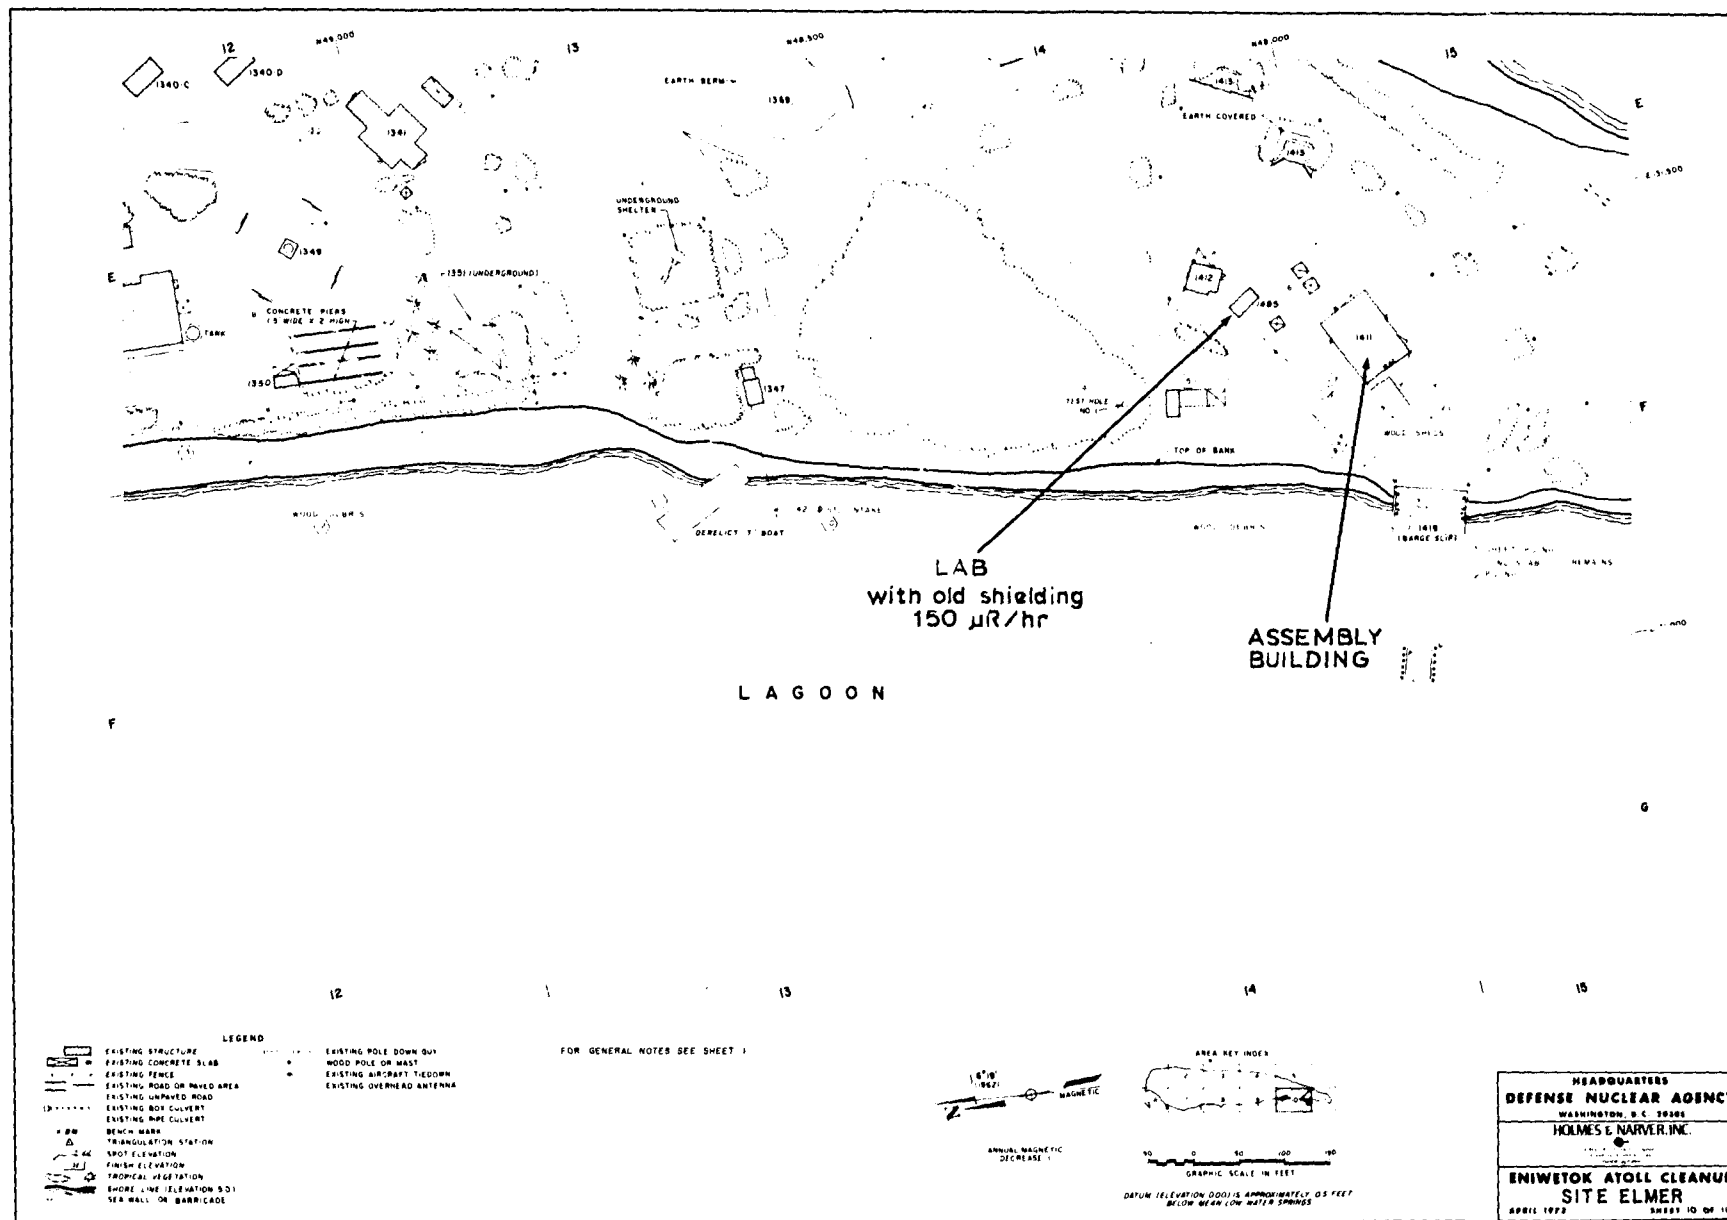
SITE ELMER, SHEET 10 OF 11
